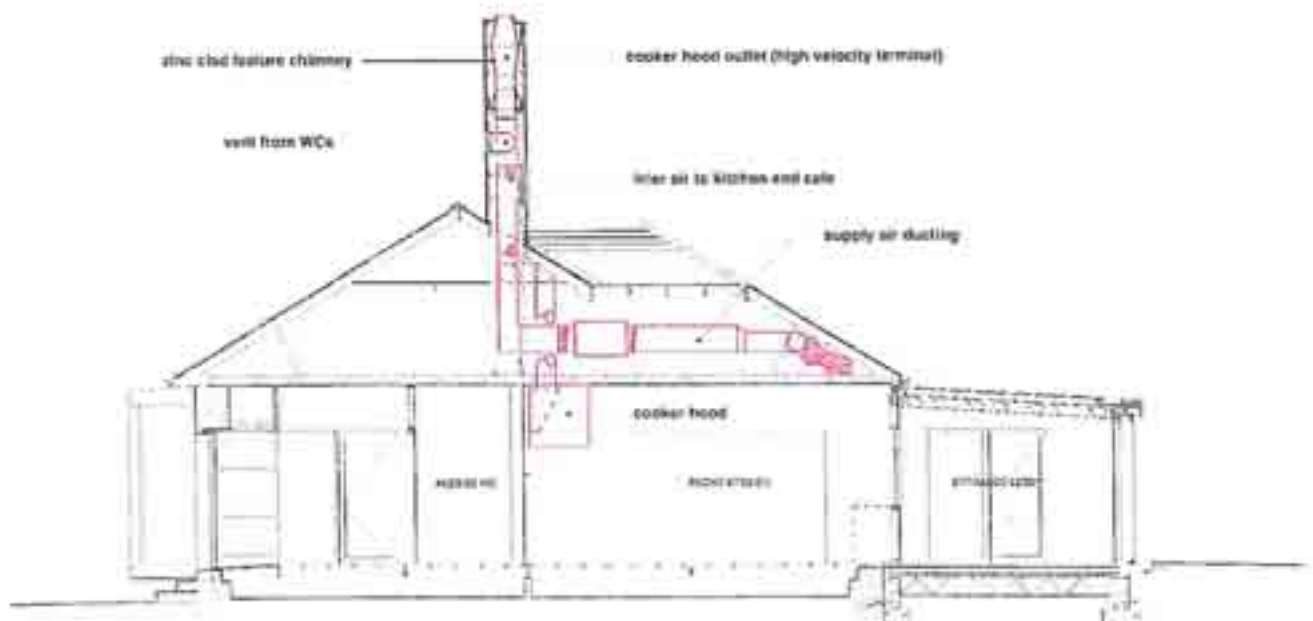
Section showing unsightly alternative of mechanical extraction and air inlet through roof
